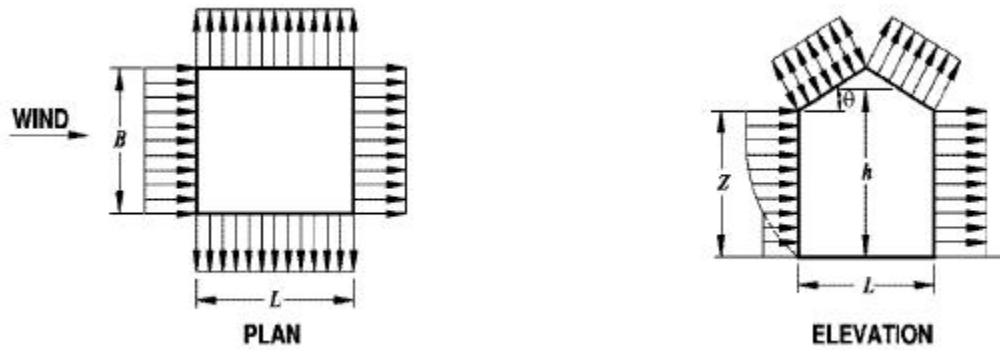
Wind pressure on a typical Gable, Hip roof house (Figure 6-6, ASCE 7-05)
